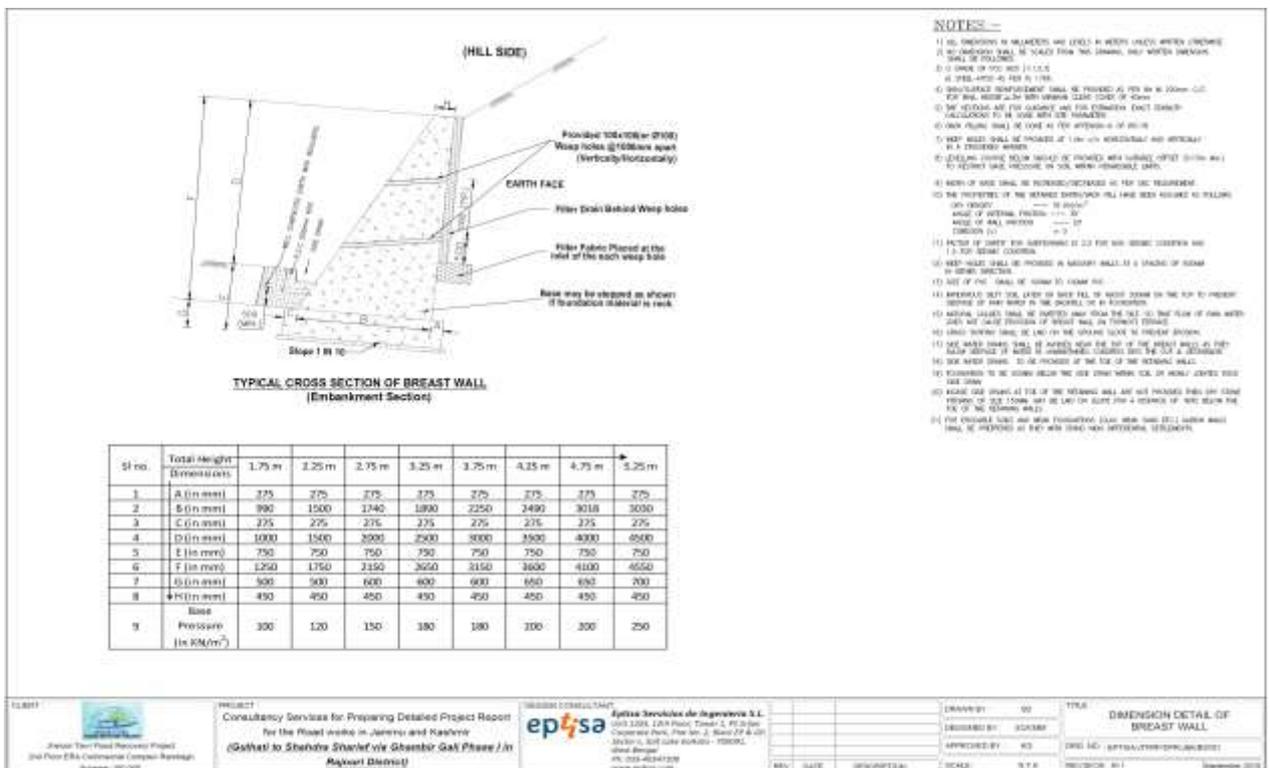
Typical Cross-Section of Protective Measures Breast Wall
